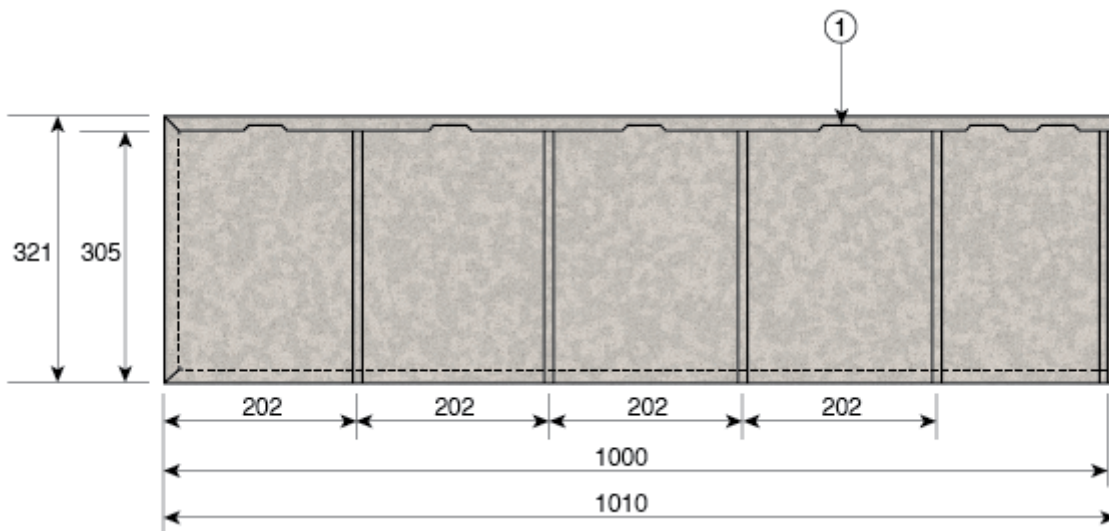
“MetalWorks® StoneCrest® Steel Shingles”
